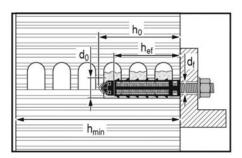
Hollow and solid brick with threaded rod HIT-V-... and two sieve sleeves HIT-SC for deeper embedment depth (see Table B6)
